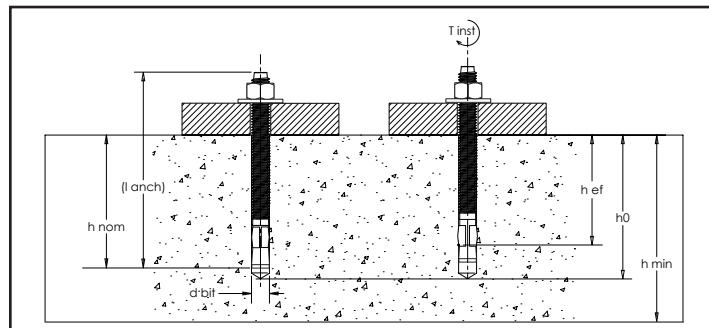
PARAWEDGE™ ANCHOR DETAIL
